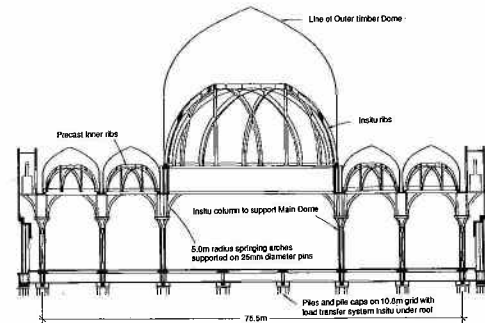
Section through mosque dome, walls, columns and floor slab
